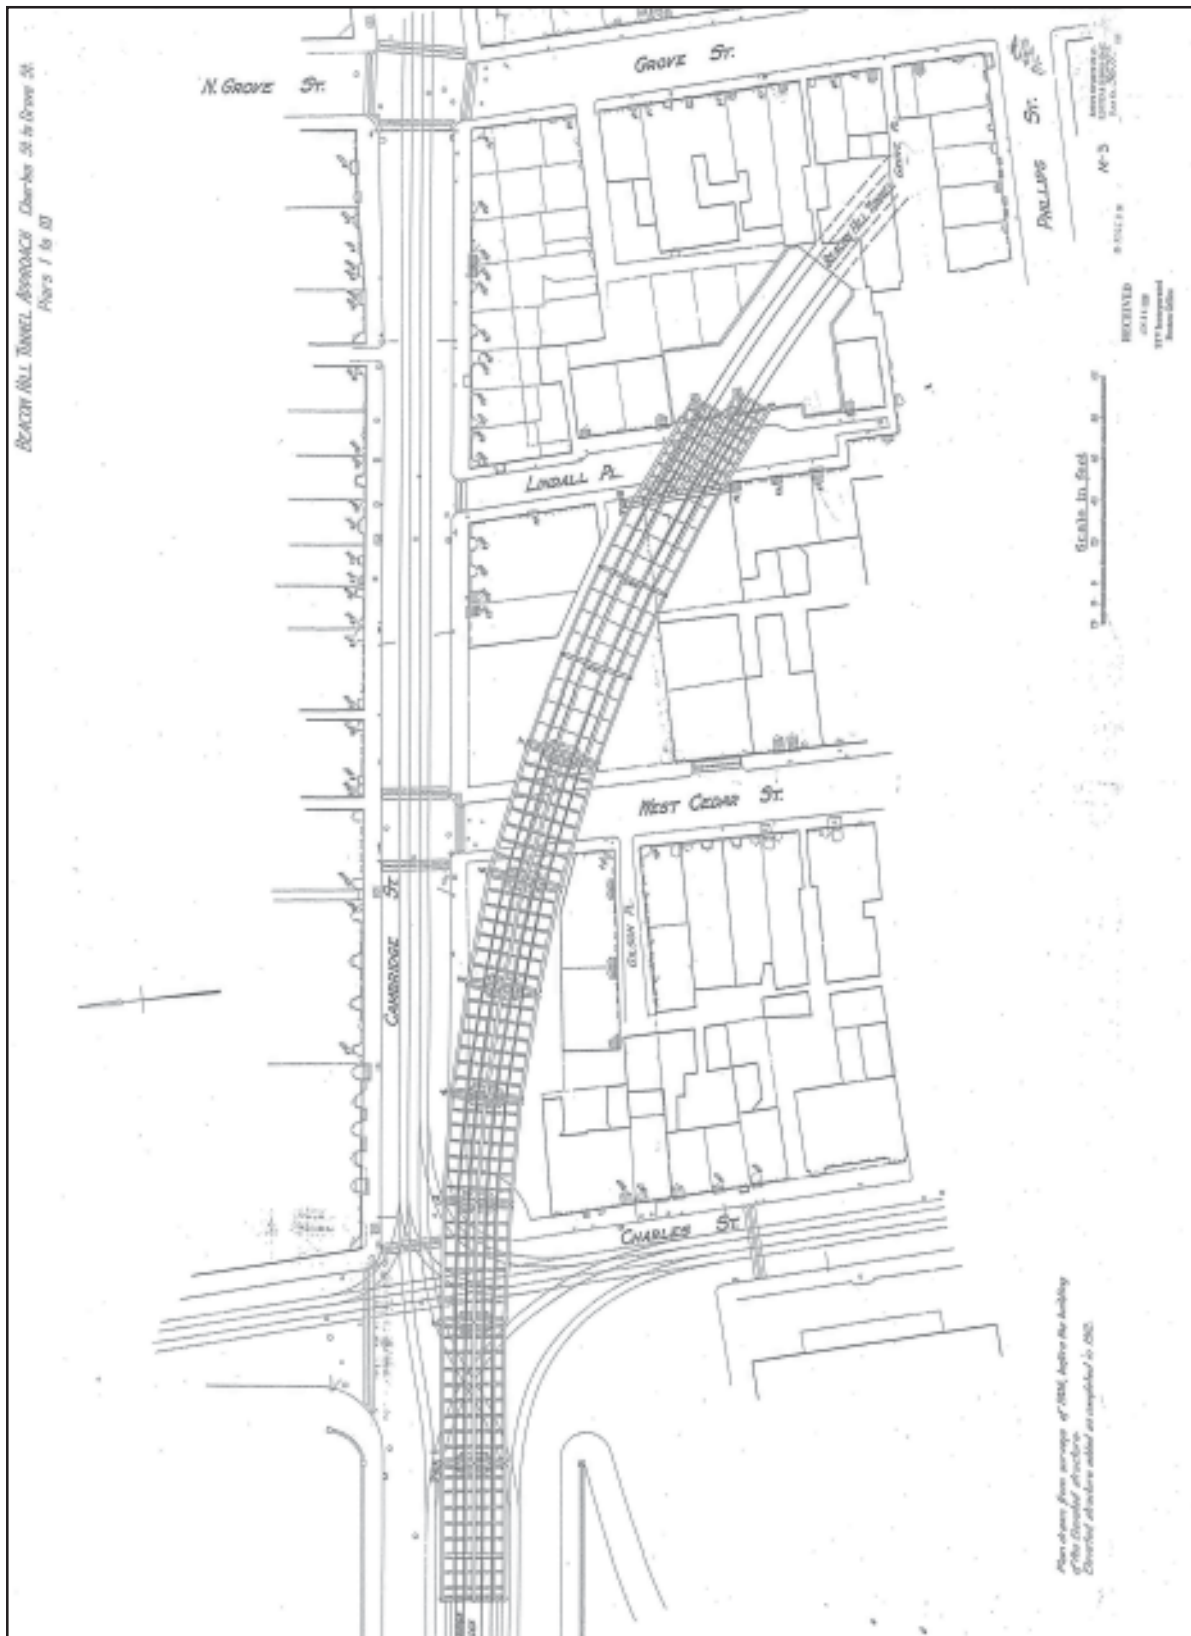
Plan of the Beacon Hill Tunnel Approach connecting the Longfellow Bridge and the Beacon Hill Tunnel in Boston (source: BERY n.d.).
